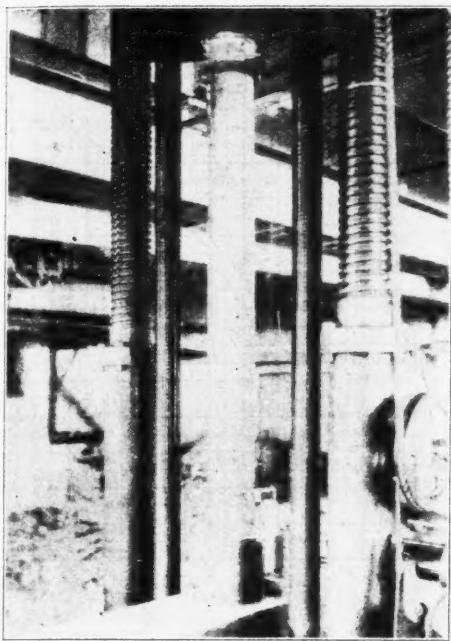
Column with Longitudinal Reinforcement Under Test.
